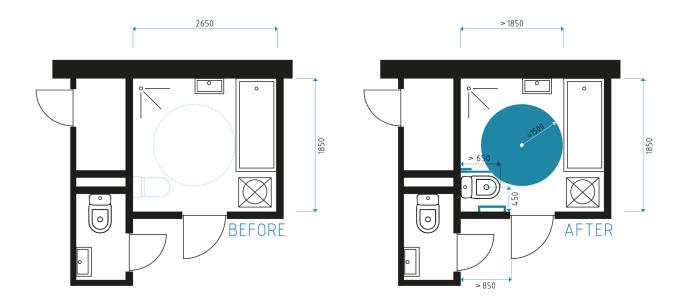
a, b Location of the installation core allows the additional implementation of another toilet in the bathroom to create an accessible bathroom (Rollová, Suláková)
